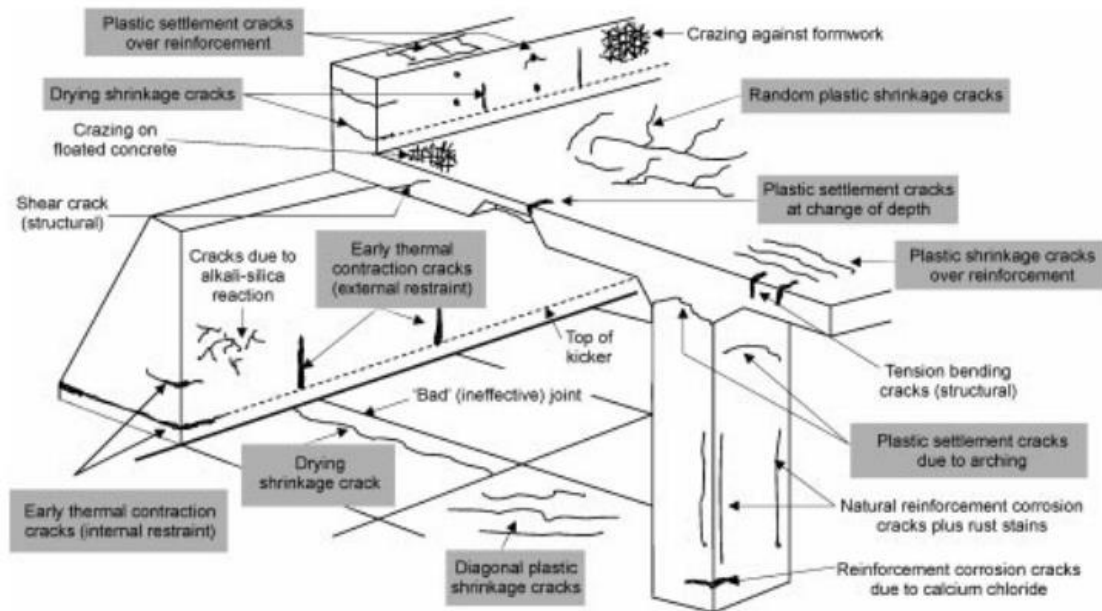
Examples of cracks in a schematic concrete structure (Brooks, 2007)
